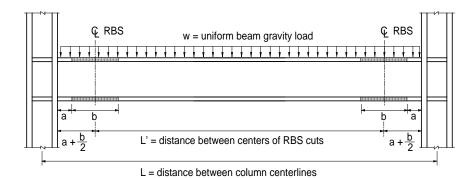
Typical Moment Frame Beam with RBS Connections (Ref. Englehardt)
